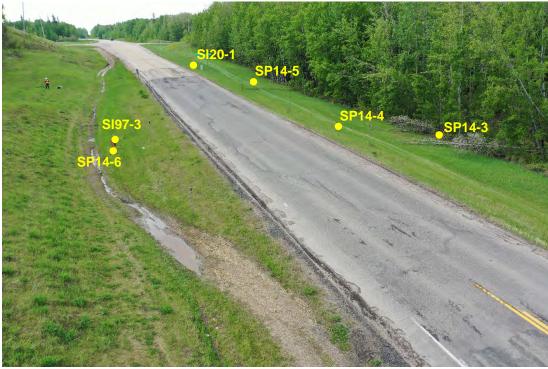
Aerial view of pavement cracking, taken by drone. Facing southwest.
